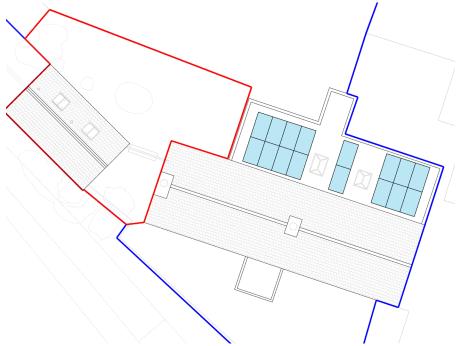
Proposed Site Plan With Location Of Proposed Solar Panel Array Position.
